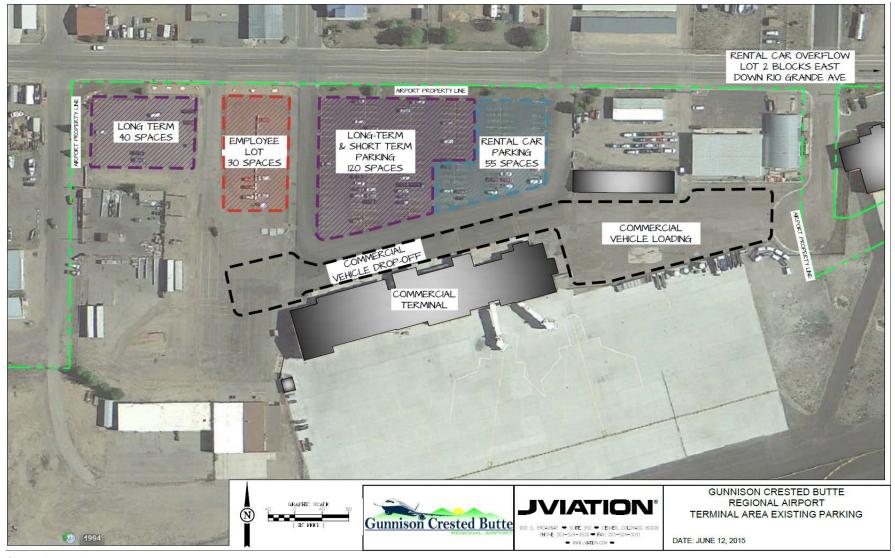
EXISTING TERMINAL BUILDING AND PARKING LOTS
